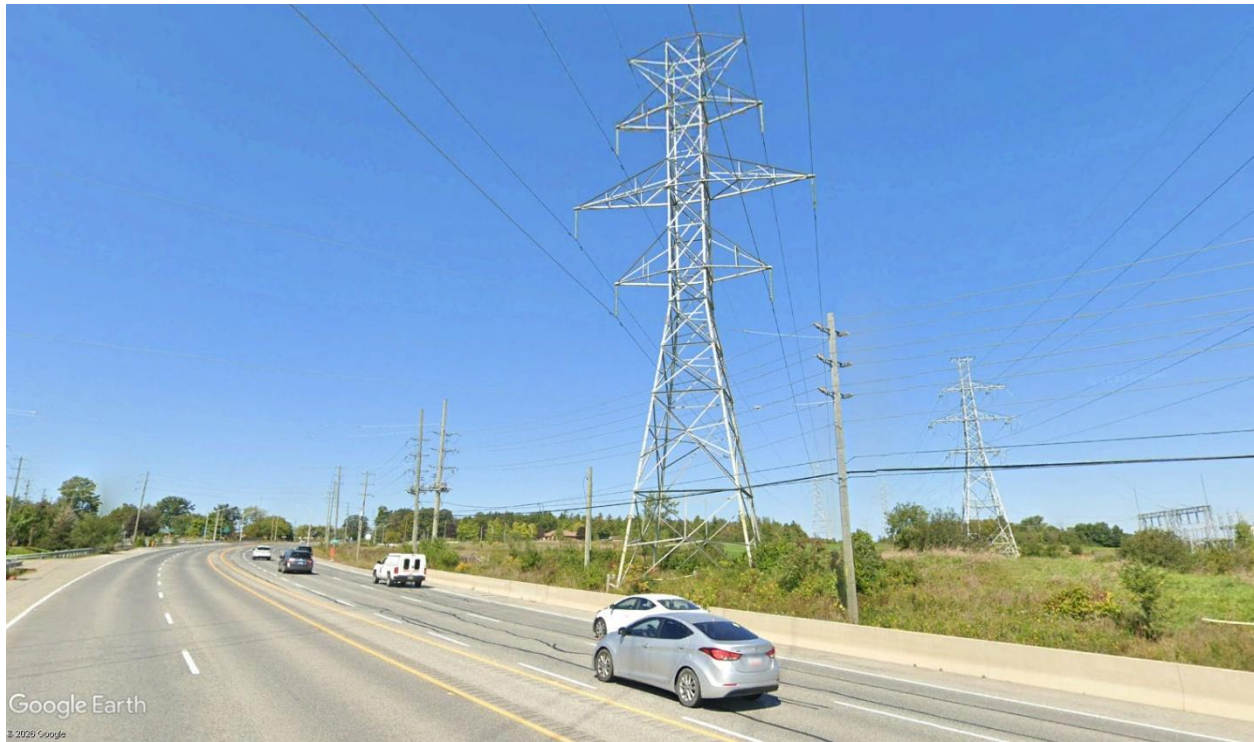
Regional Road 25 Near Hydro Corridor Between Burnhamthorpe Road and Henderson Road (Looking North)
